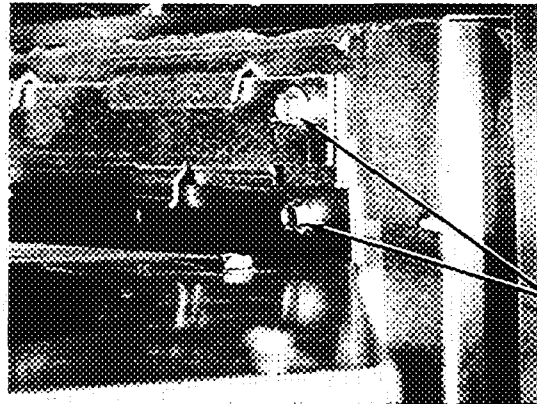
Basepan Insulation Over Vertical Duct Opening
